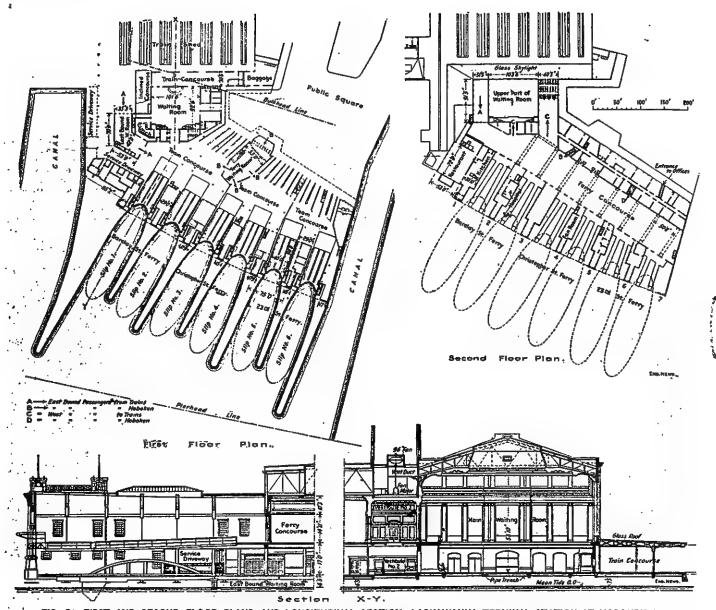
FIRST AND SECOND FLOOR PLANS, AND LONGITUDINAL SECTION; LACKAWANNA TERMINAL STATION AT HOBOKEN, N. J. (Note.—Upper Deck Landing Bridge Shown in Longitudinal Section is old type. See Fig. 13 for drawing of bridge actually used.)
